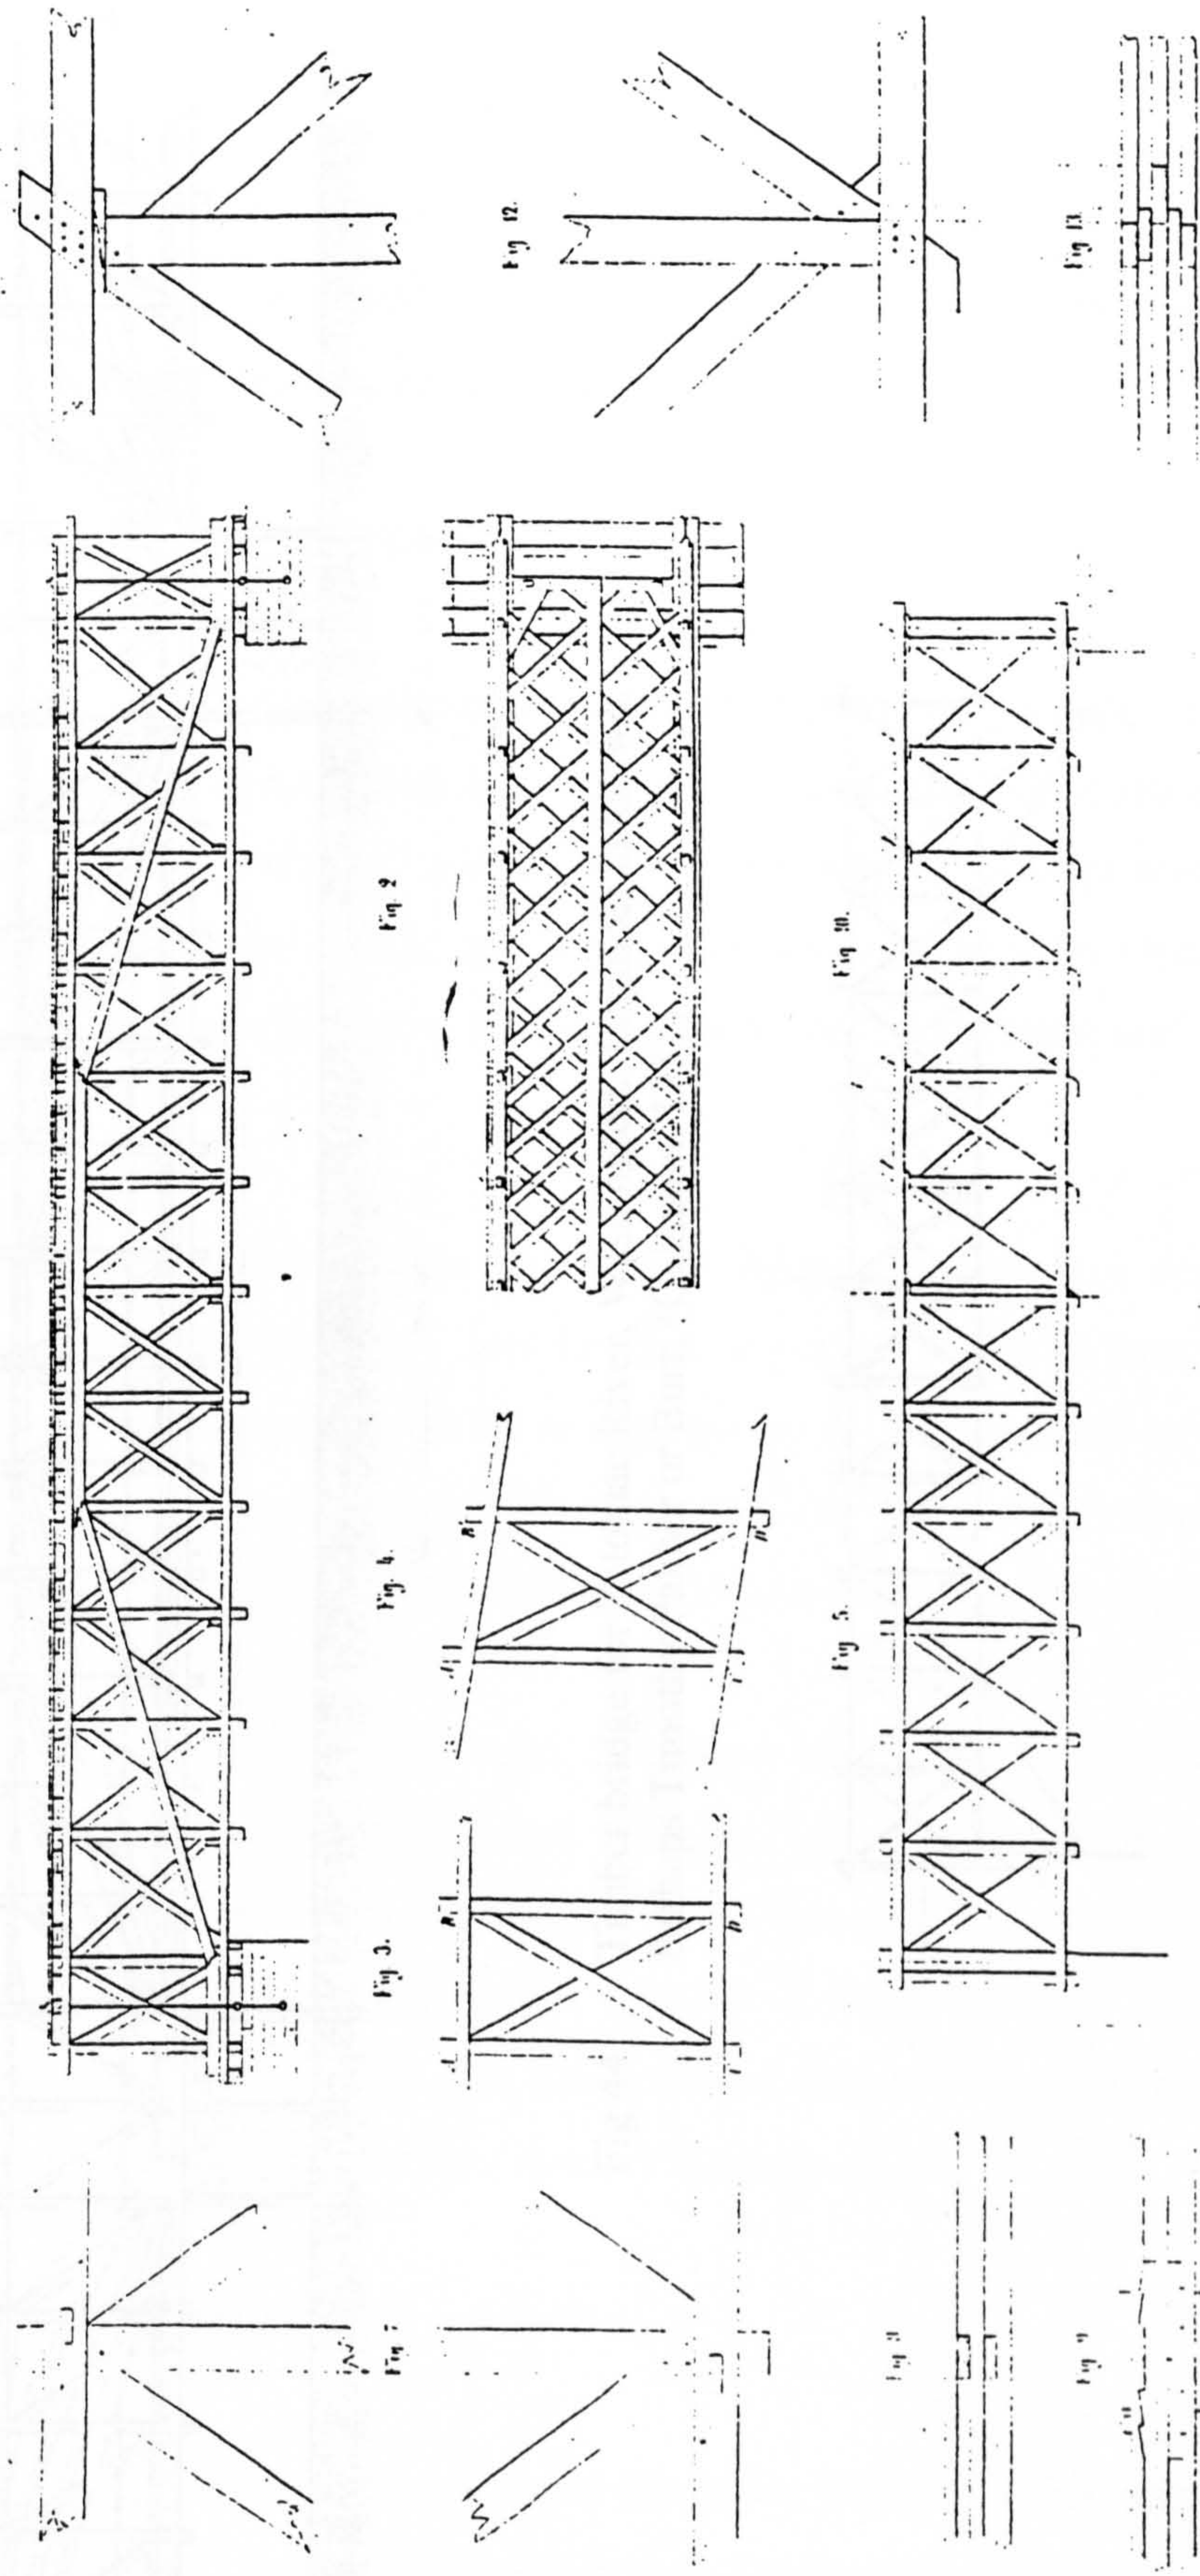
Colonel S H Long. Typical truss system. (Culmann, 1851)
